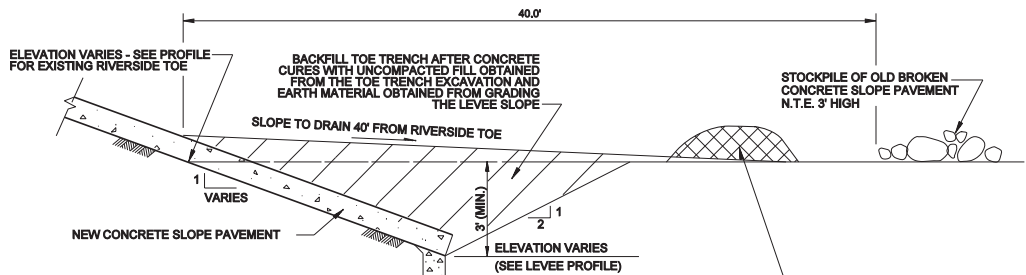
DETAIL FOR TIEING NEW CSP TO EXISTING CSP DUE TO GRADE RAISE.
